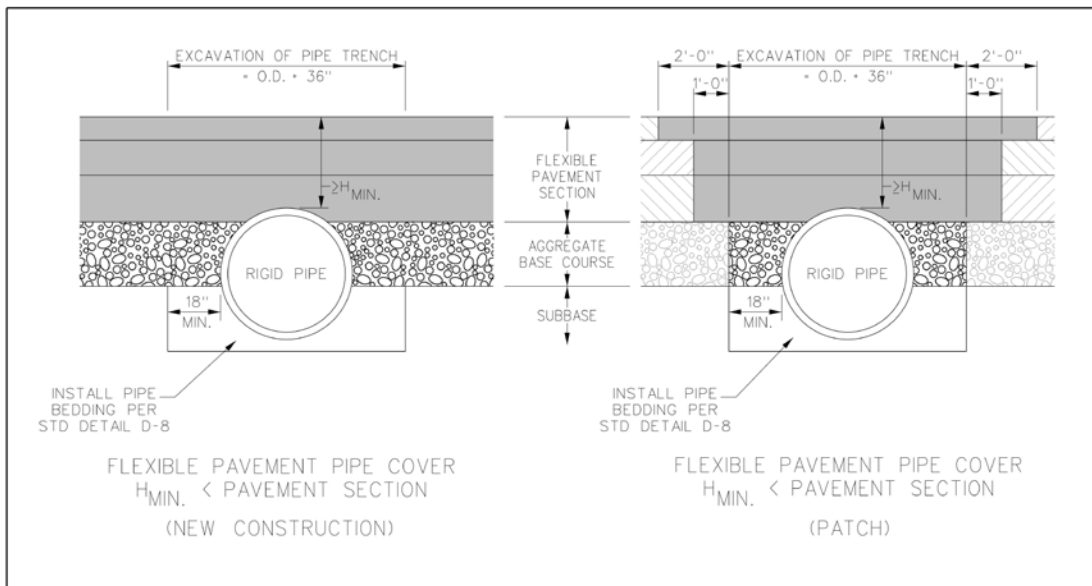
b Existing Pavement Shallow Pipe Cover Details
